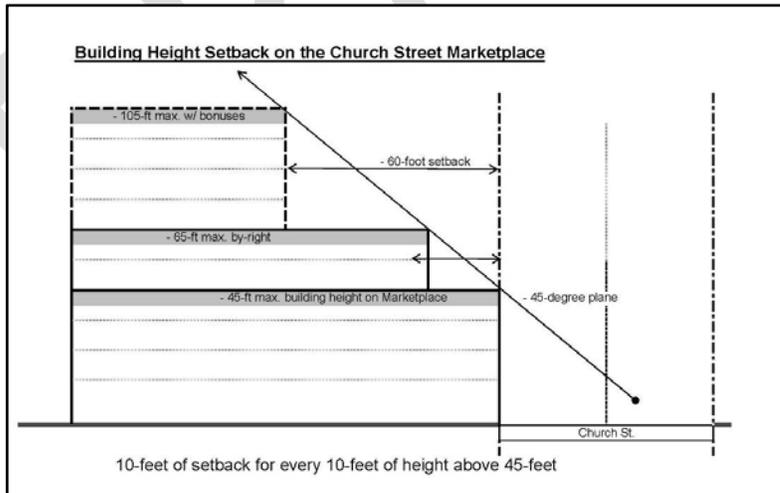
Measuring Height Limits for Church Street Buildings
